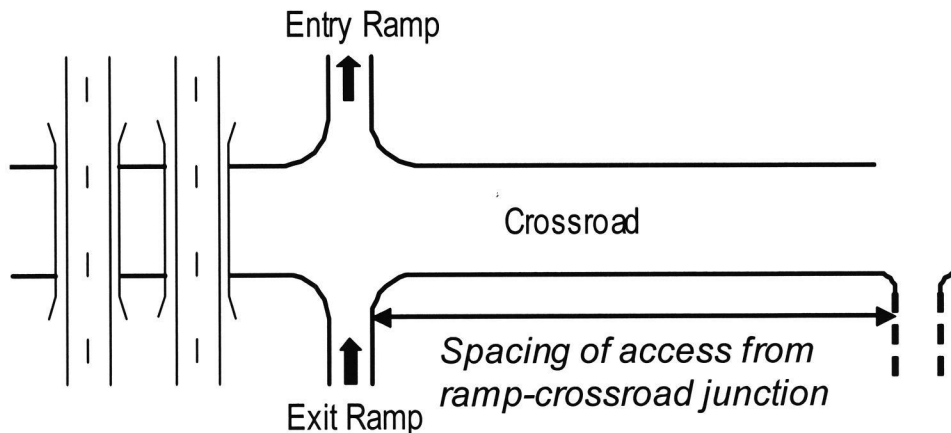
Access spacing at ramp-crossroad junctions
